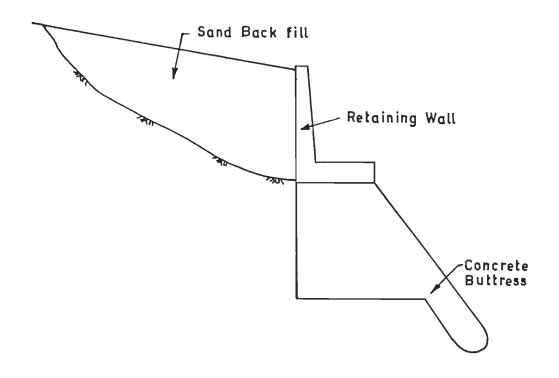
Retaining Wall and Buttress to Stabilise the Slope
